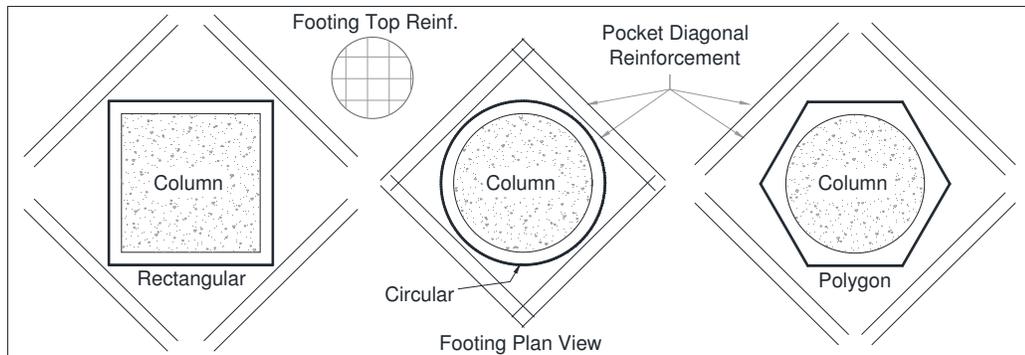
Diagonal Reinforcing Around Footing Pockets
